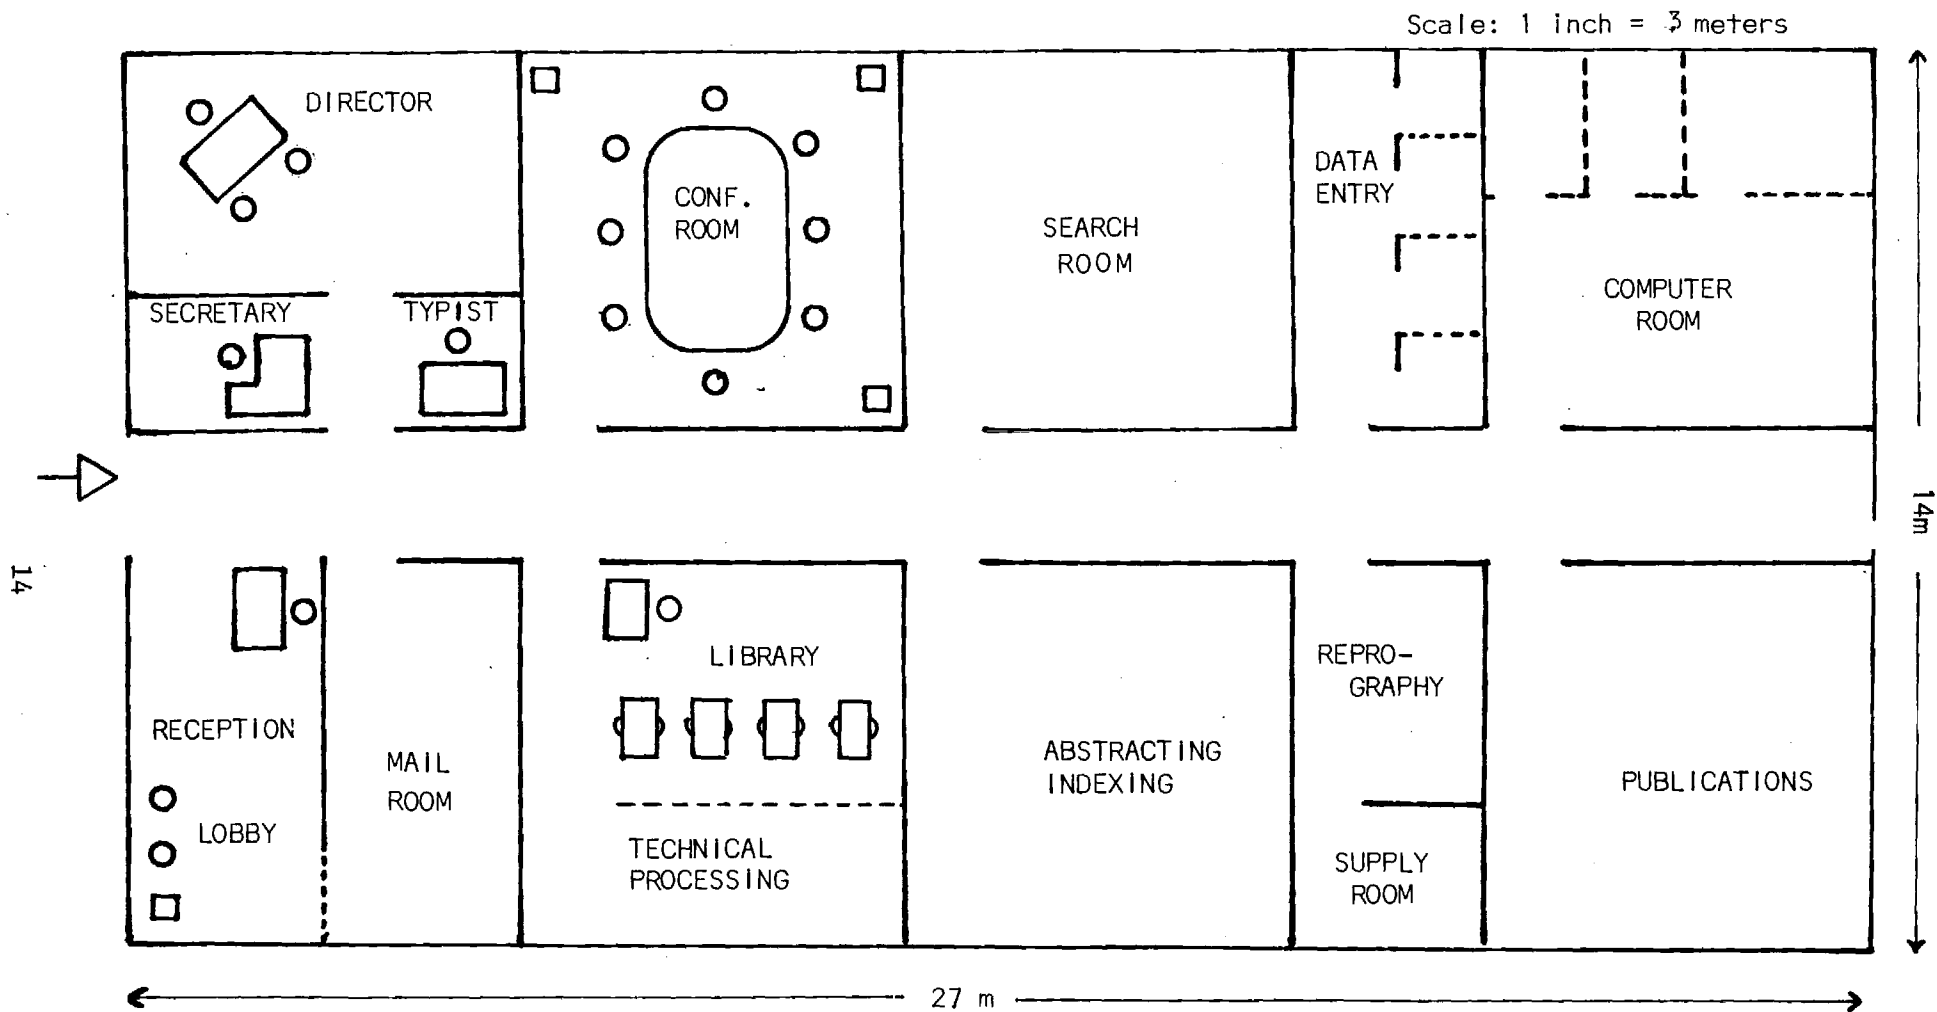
INFORMATION SERVICE: TYPICAL FLOOR PLAN
